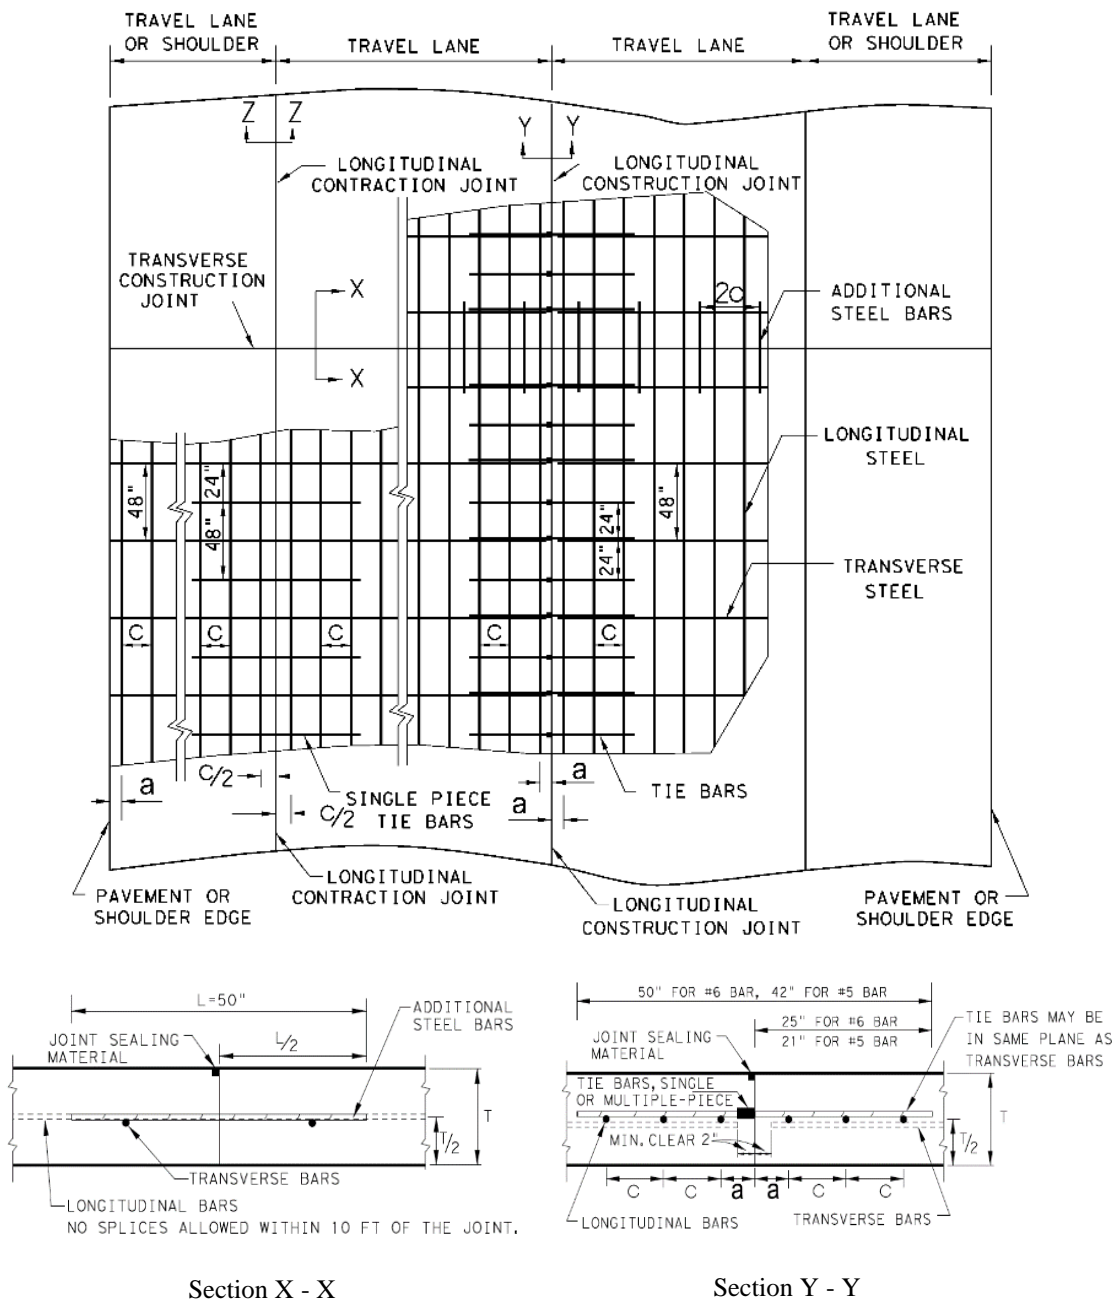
Typical CRCP Slab and Construction Joint Layout (Texas Department of Transportation (TxDOT), (2013), Continuously Reinforced Concrete Pavement One Layer Steel Bar Placement, CRCP (1)-13)
